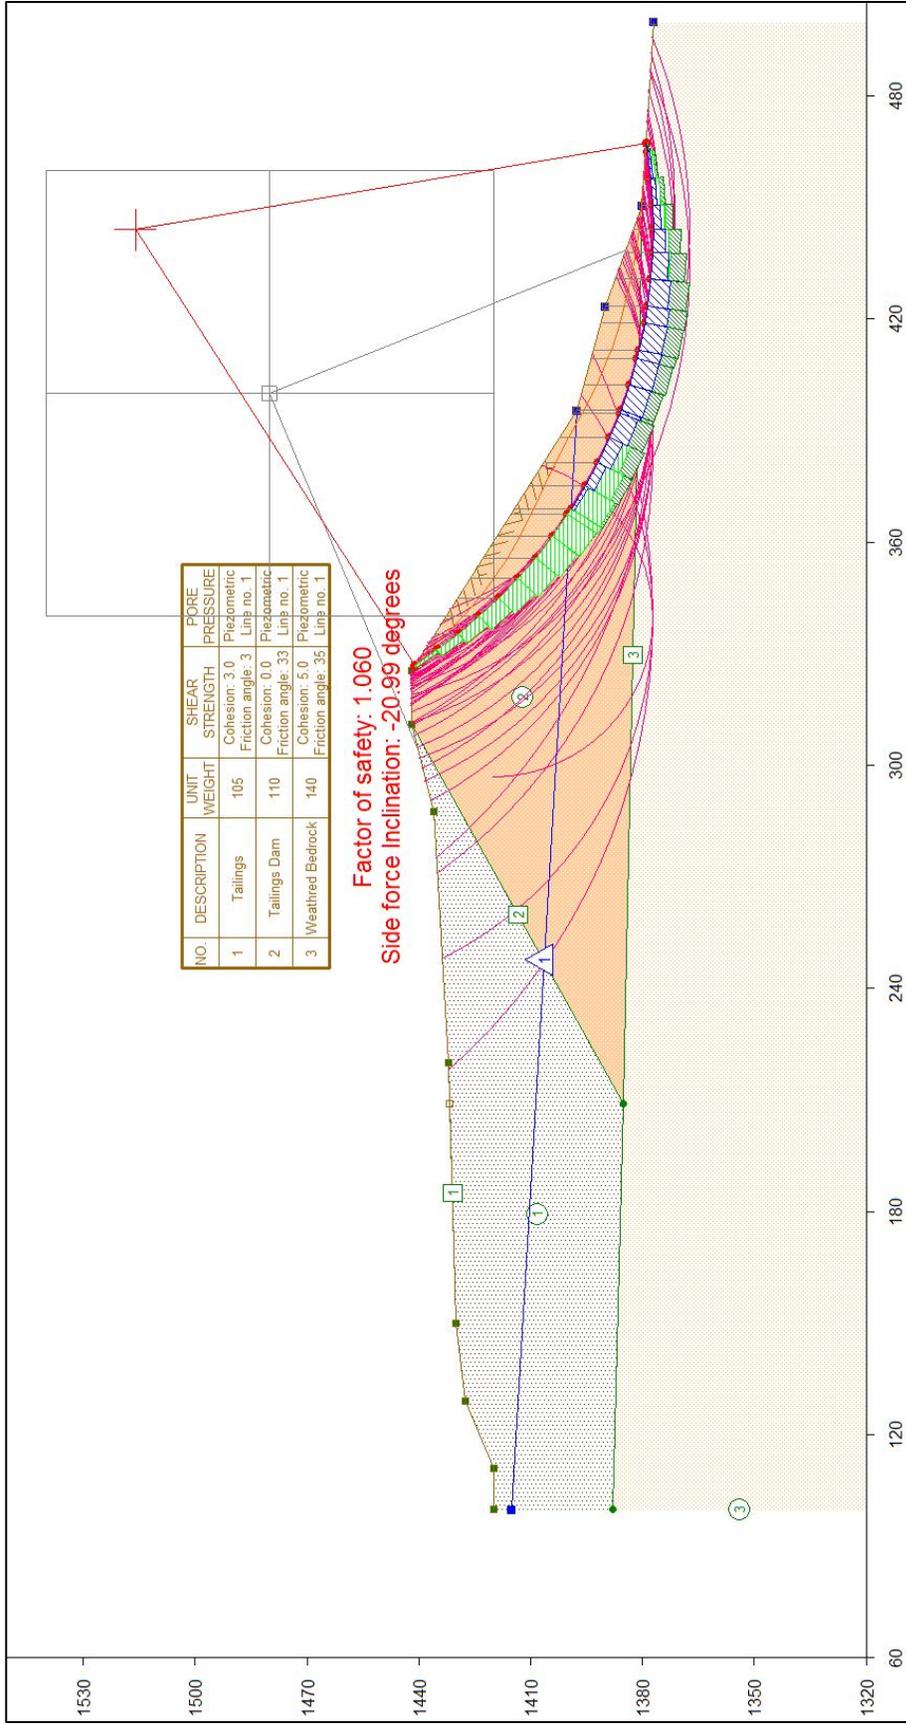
Earth Tailings Storage Dam - Slope Stability Results
